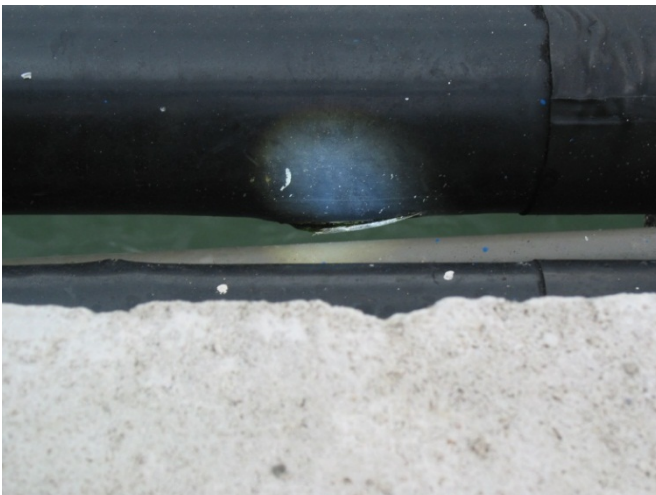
Damaged water pipe adjacent to pier (9.97190° N 84.83075° W).
